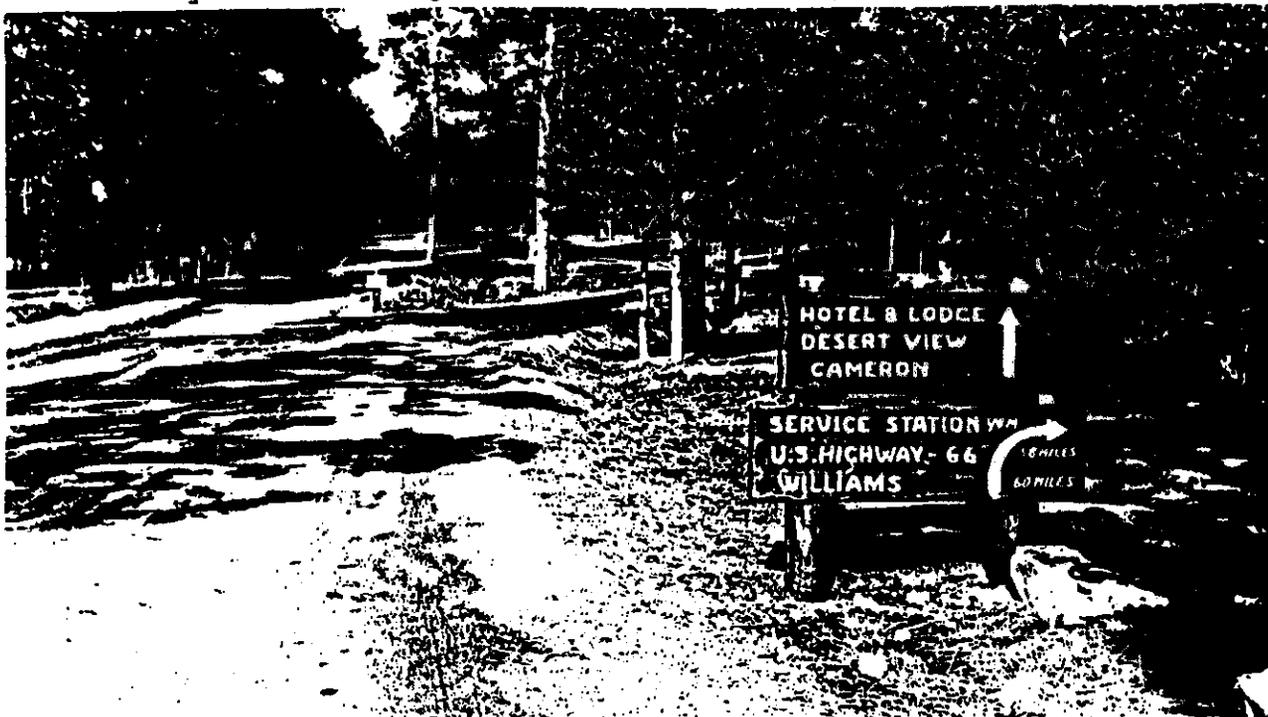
Village Loop facing east with the divided road in background, 1947. Note the sign types and traffic island at intersection with Center road which, in that year, is still the south entrance road. (GRCA Image #14614 & #9492, GCSC)
